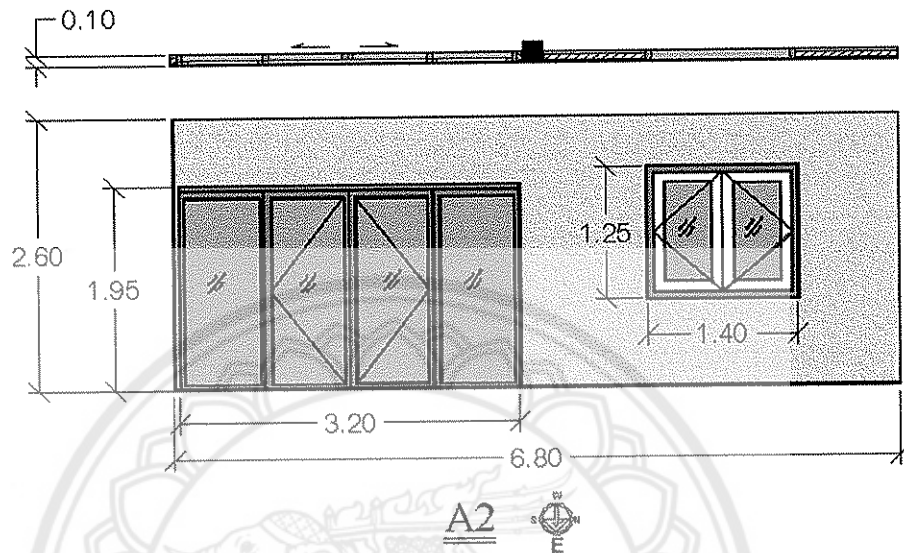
This is a side of wall (A2) that is showed detail about wall and glass window and section of wall and glass window.
